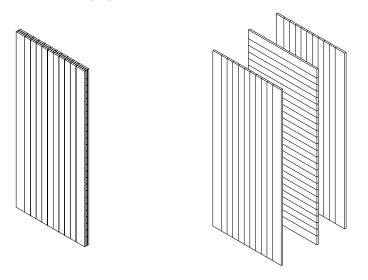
Exterior Door – Option D: Cross-Laminated Timber – Assembled & Exploded Views
